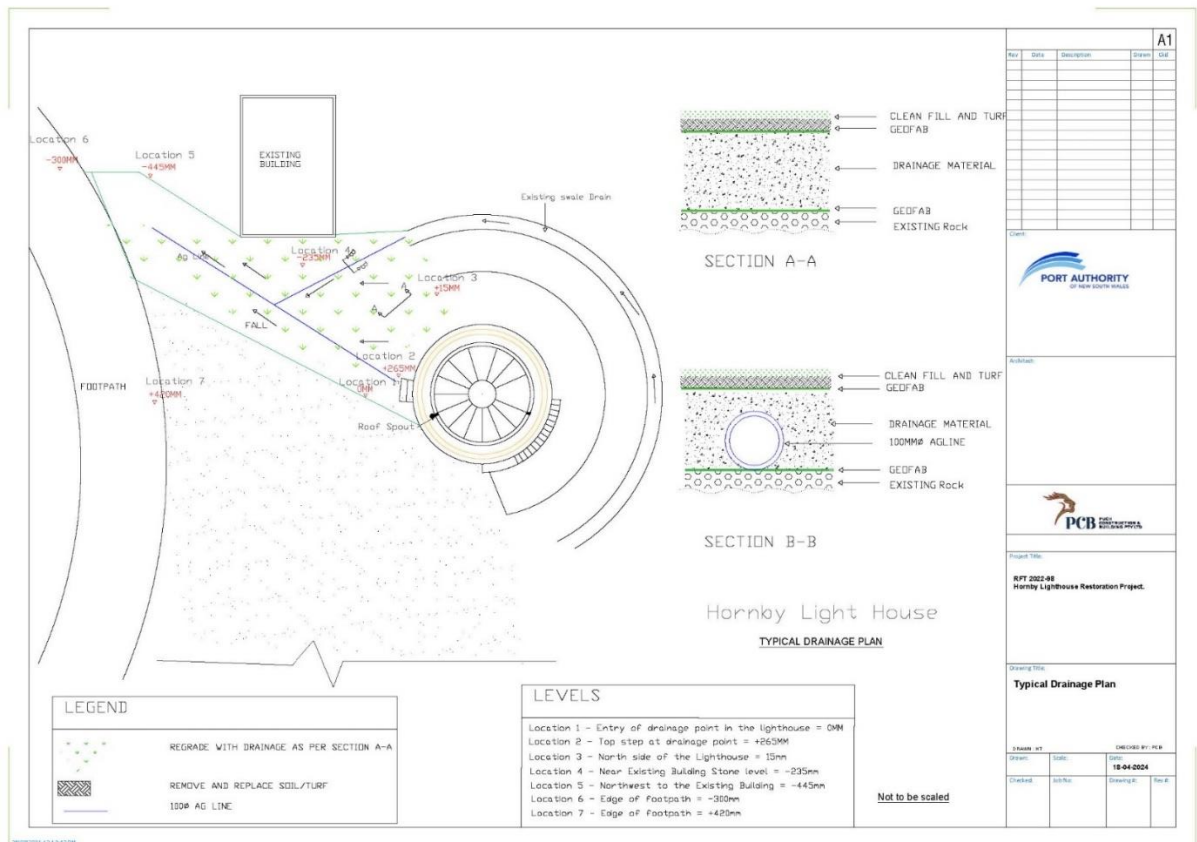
Proposed Site Layout Drainage Plan. PCB (September 2024).
